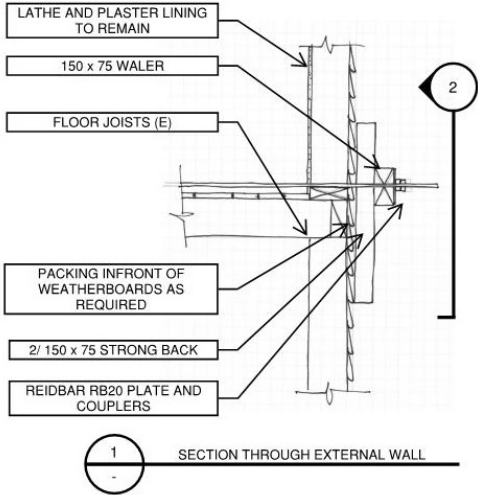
First floor temporary works detailing for Reid brace floor diaphragm.
